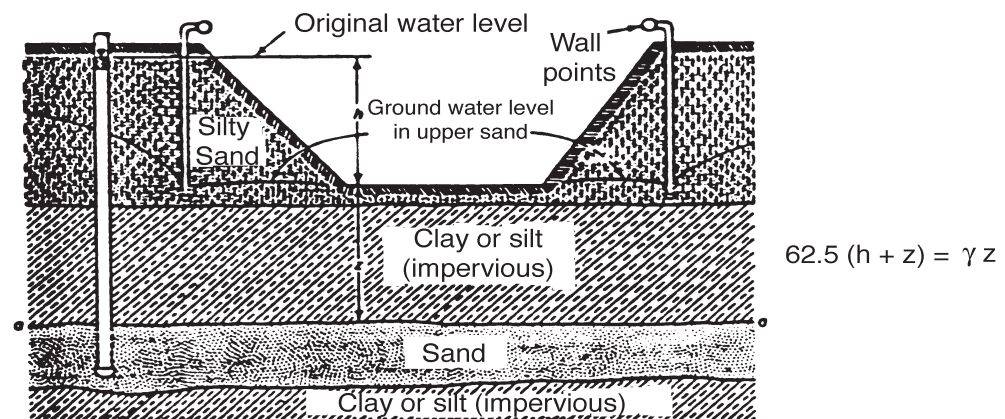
Bottom of Excavation Stability Problems due to Excess Hydrostatic Head Against an Impervious Layer
